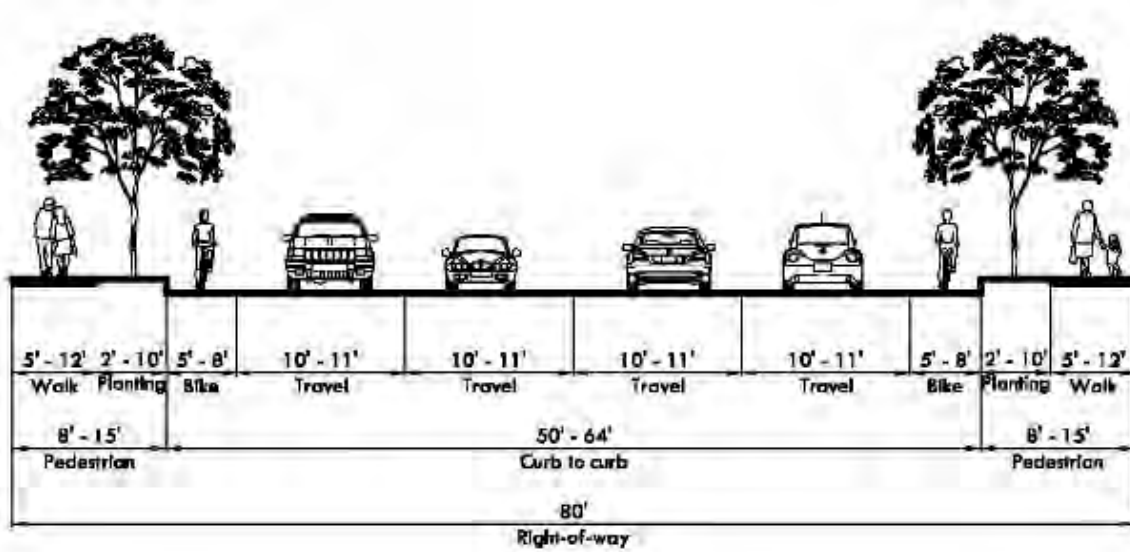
Typical "B" Street with 70'-80' Right-of-Way Section
